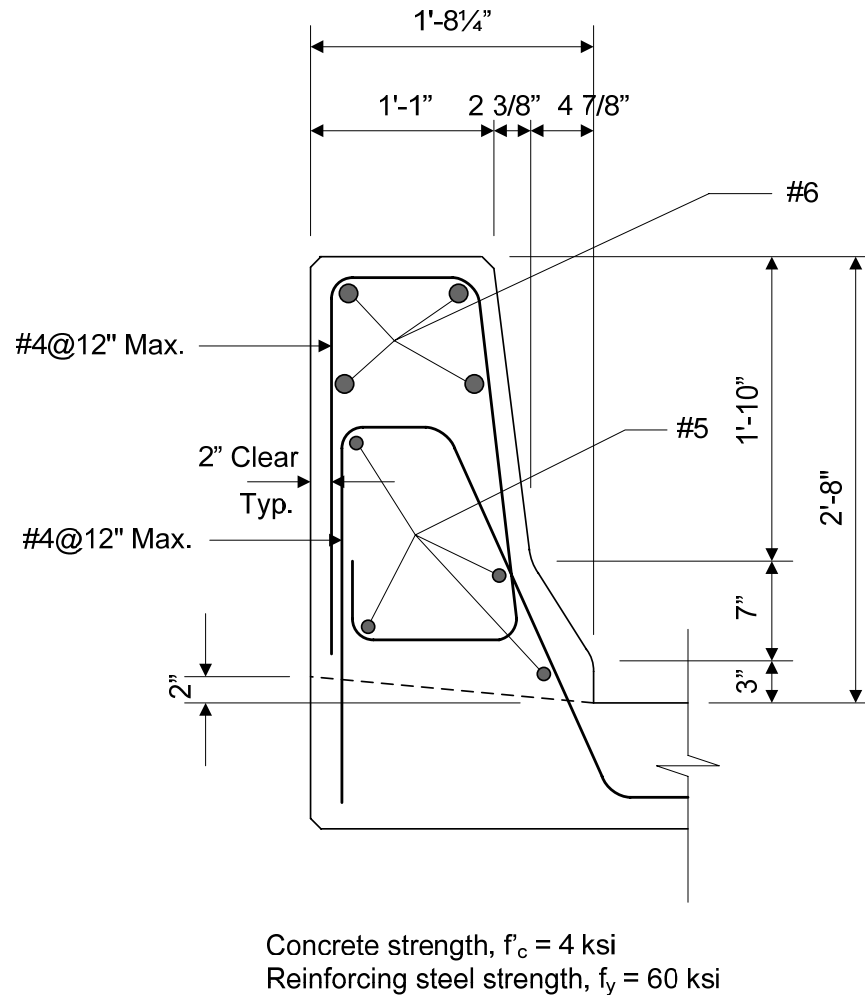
Alternate Concrete Barrier, Approved for Test Level 4
